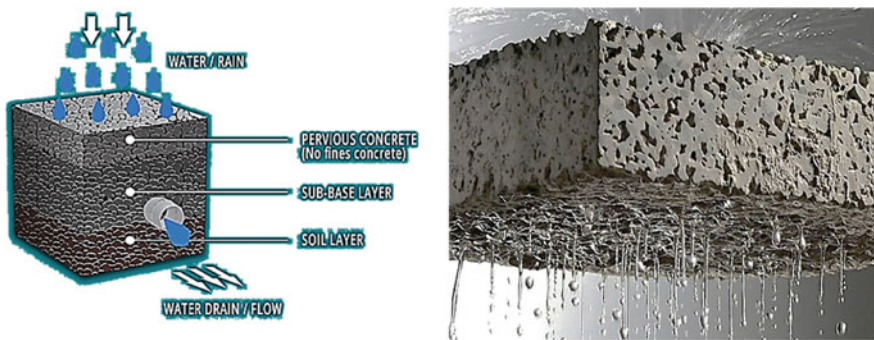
Uses of lightweight concrete in pavement and drainage layers
